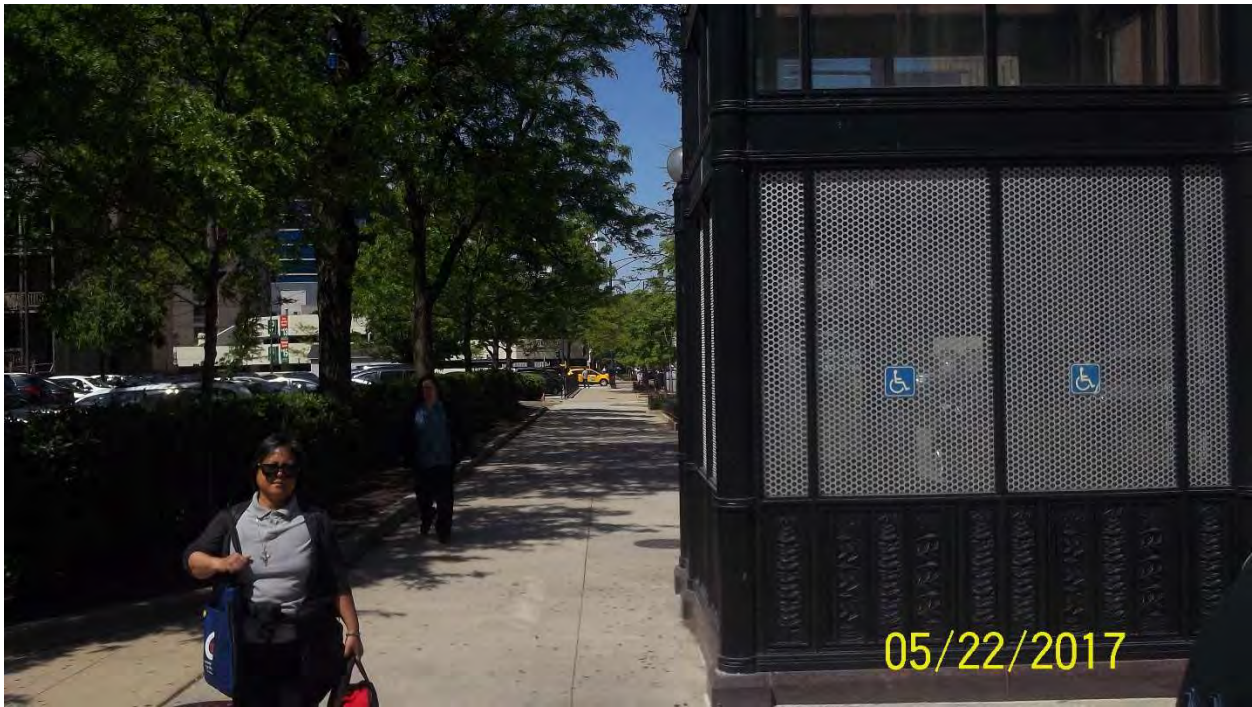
Southwest corner of Chicago Ave. / State St. – Looking West
